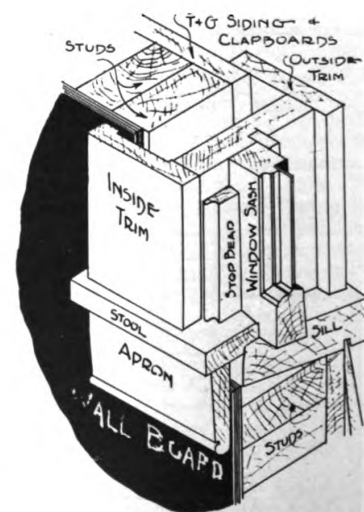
Isometric perspective of jamb and sill of window when wallboard is used.
